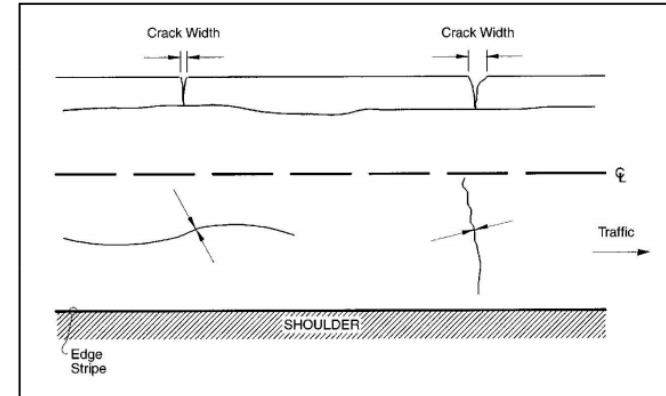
Measuring Crack Width on Asphalt Pavement
